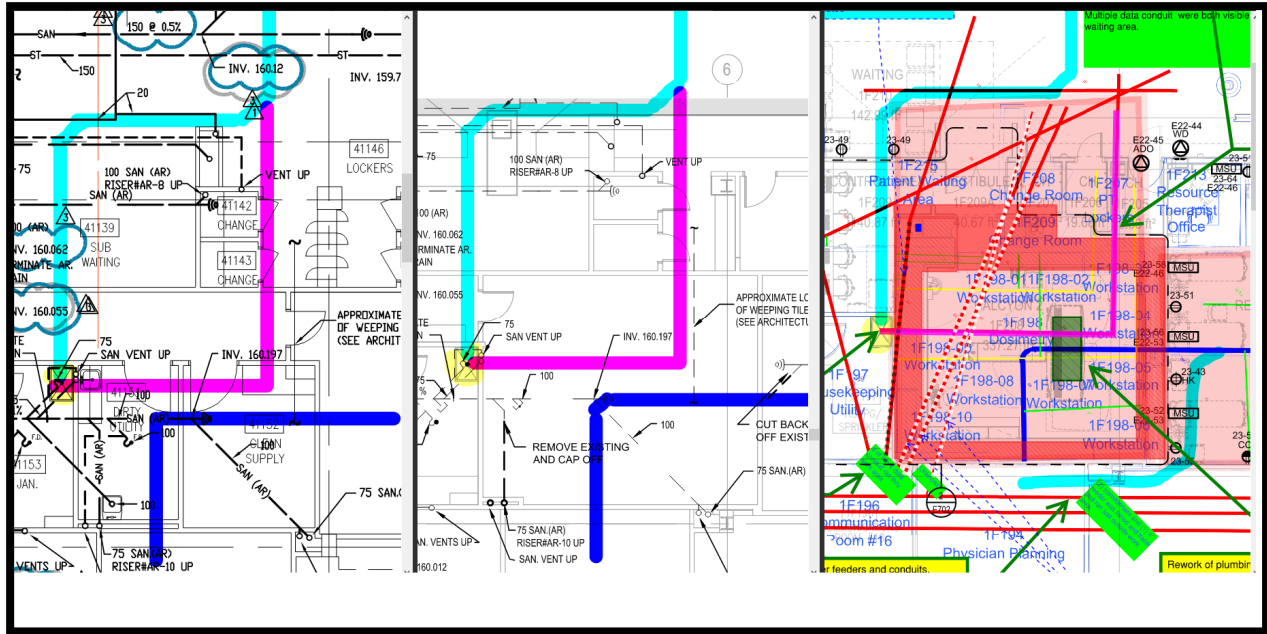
Comparison between underground piping scan for Halcyon #2 and existing drawings
